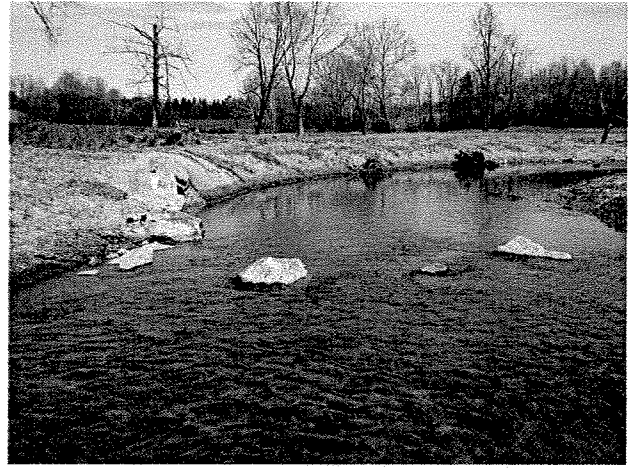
Looking downstream at log toe protection and root wads installed between MS Stations 18+00 and 17+00. (4/7/04)
